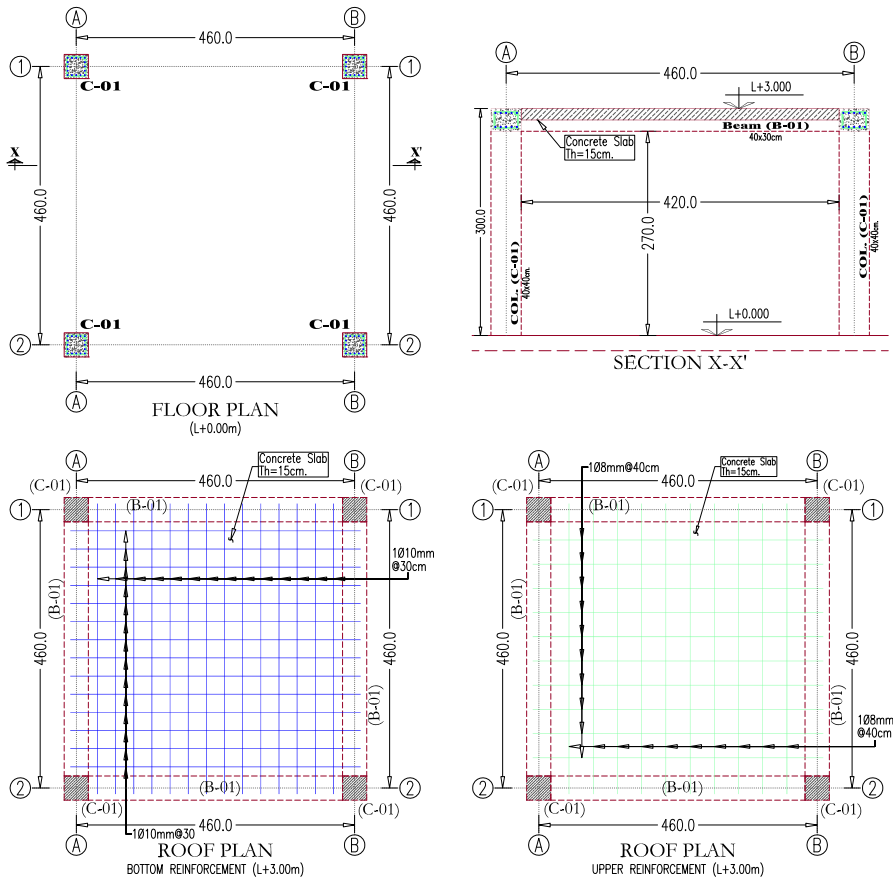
Structural drawings (plans and elevations) of a typical one-storey construction.
